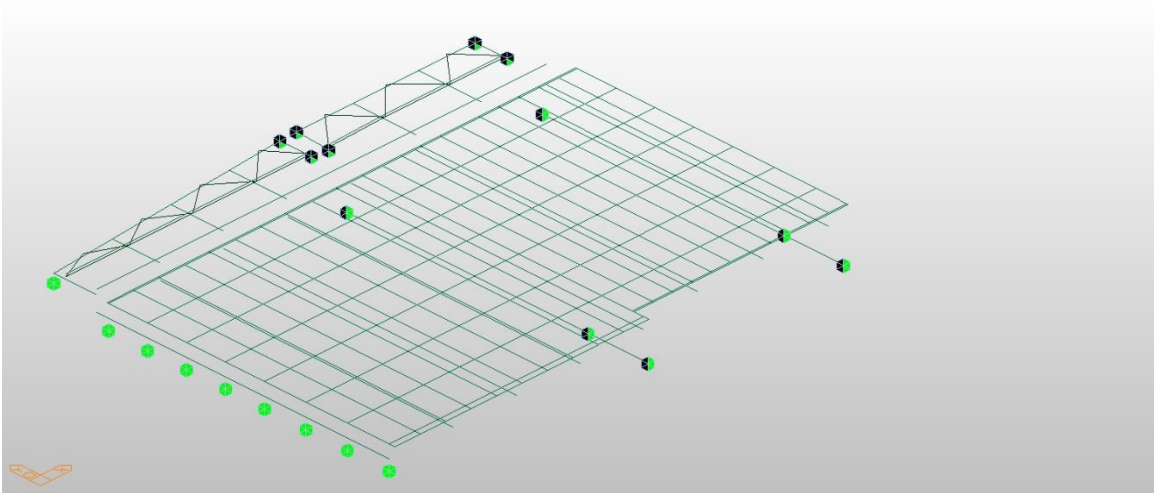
Approach and Tower Support Conditions (Similar at North Tower)
